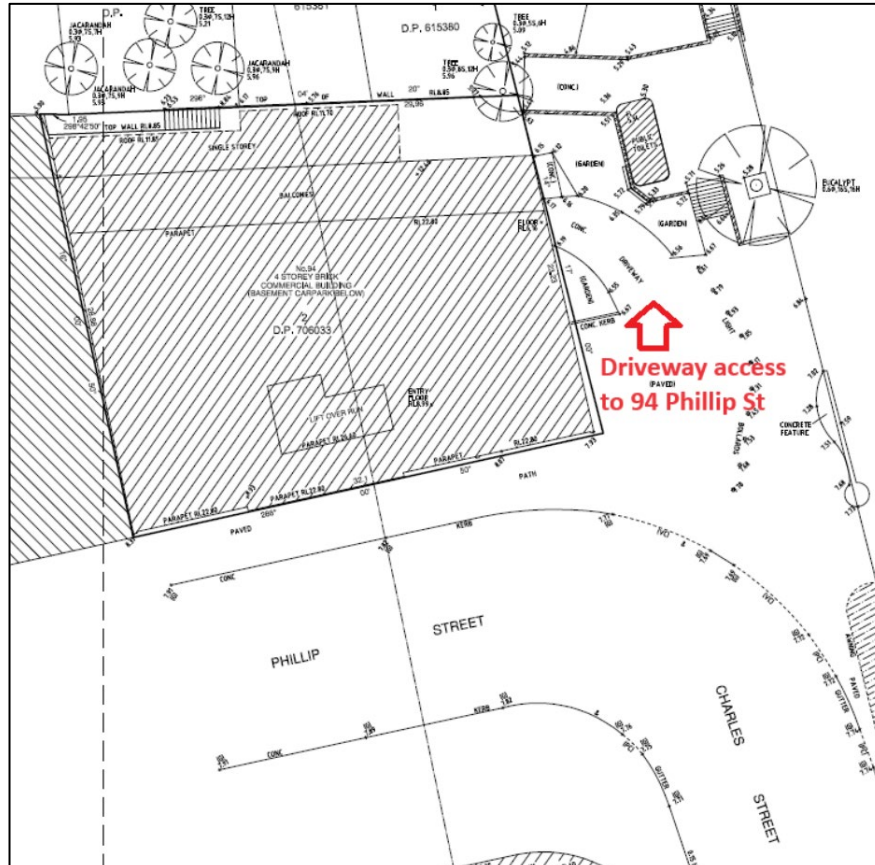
Site/s at 90-94 Phillip Street, Parramatta subject to the Planning Proposal
